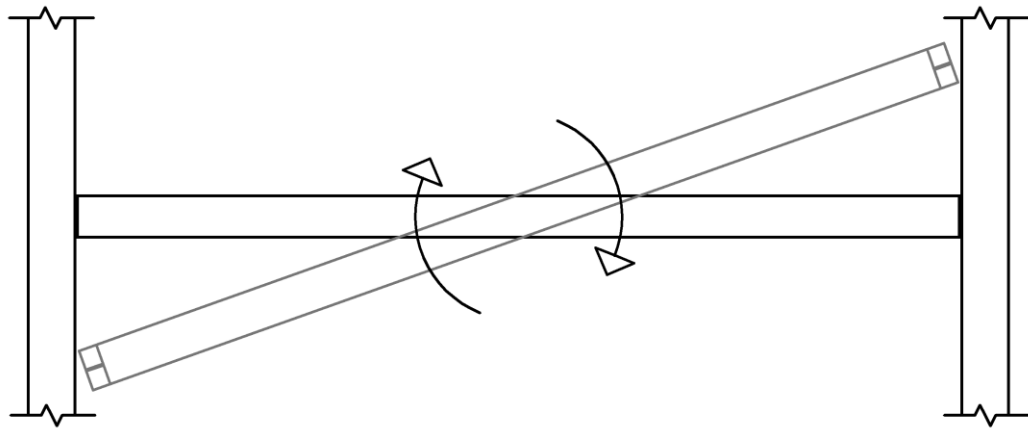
Plan View of Installation Method for Shear Tab Connection with Beam Coped at Both Ends Showing Need to Rotate the Member
